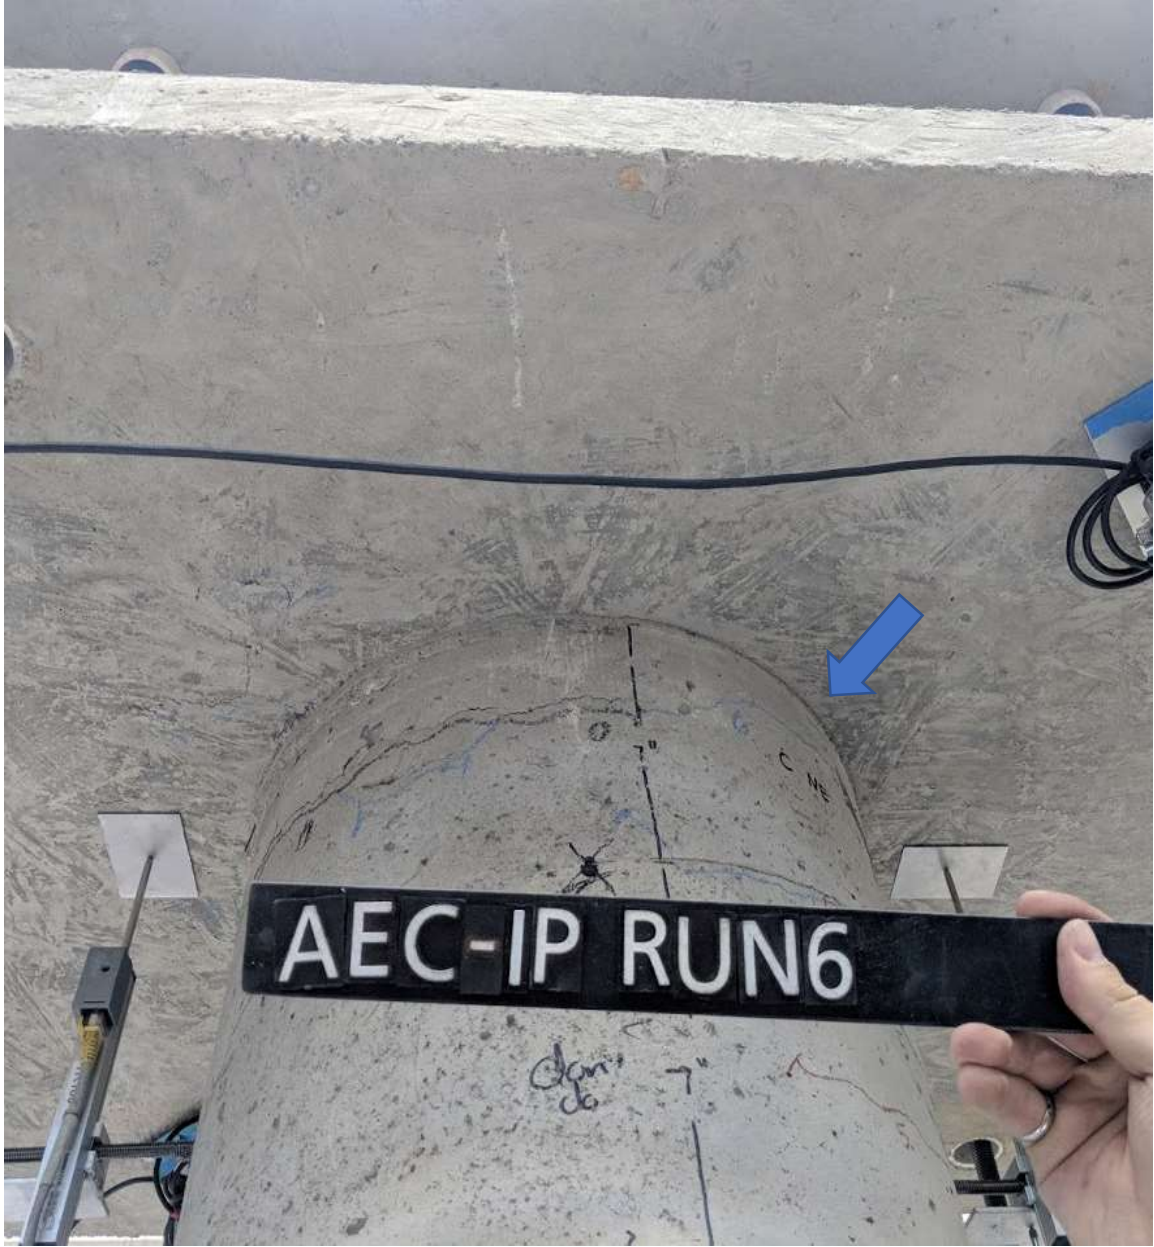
Run 6 – Cracks marked before testing (CIP – E face)
